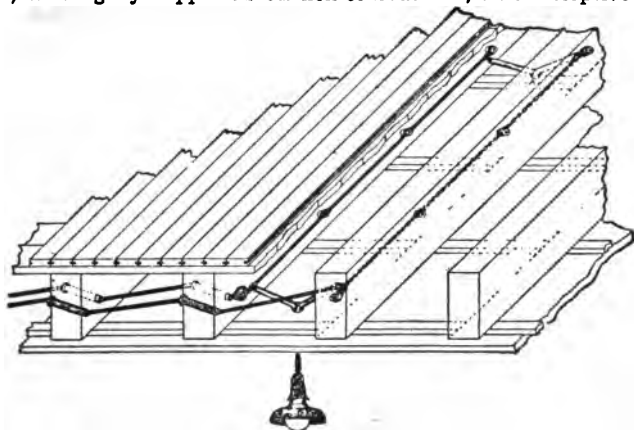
,098.—Concealed knob and tube wiring. The wires are carried on porcelain knobs attached to the beams. If run perpendicular to the beams, holes are bored in the latter and porcelain tubes with a shoulder at one end, inserted in the holes through which the wires pass. The knobs should support the wires at least one inch from the surface over which they run, and should not be spaced further than  $4\frac{1}{2}$  feet apart. The use of split knobs does away with the necessity of using tie wires. The conductors must be at least 5 inches apart and it is better to support them on separate beams when possible. Each wire must be encased in a piece of flexible tube at all switches, outlets, etc., and this piece of tubing should be sufficiently long to extend from the last insulator and project at least one inch beyond the outlet.
